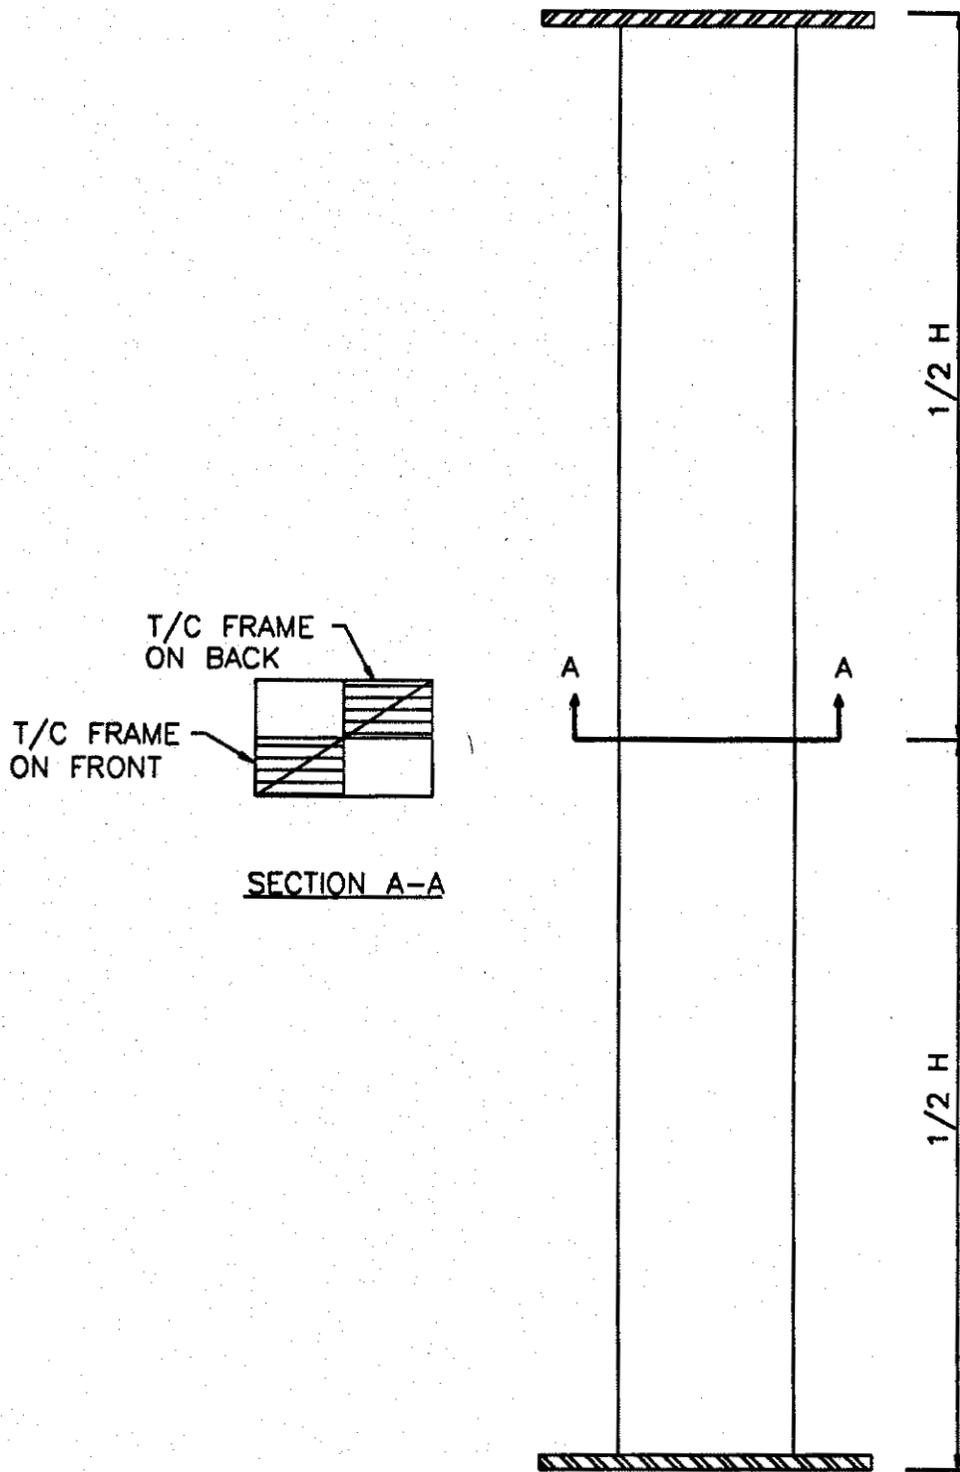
LAYOUT OF T/C FRAMES IN CONCRETE: COLUMN NO. 3 (305 x 457 mm)
